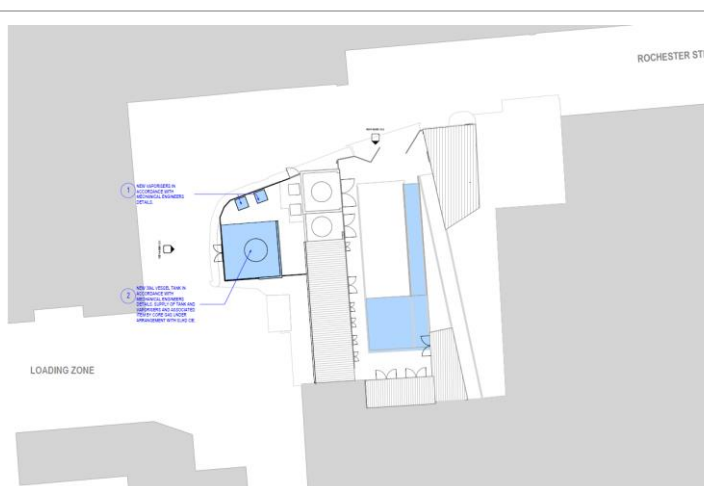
Approved Ground Floor Plan – Western Campus (source: Jacobs, dated 19 February 2024)
